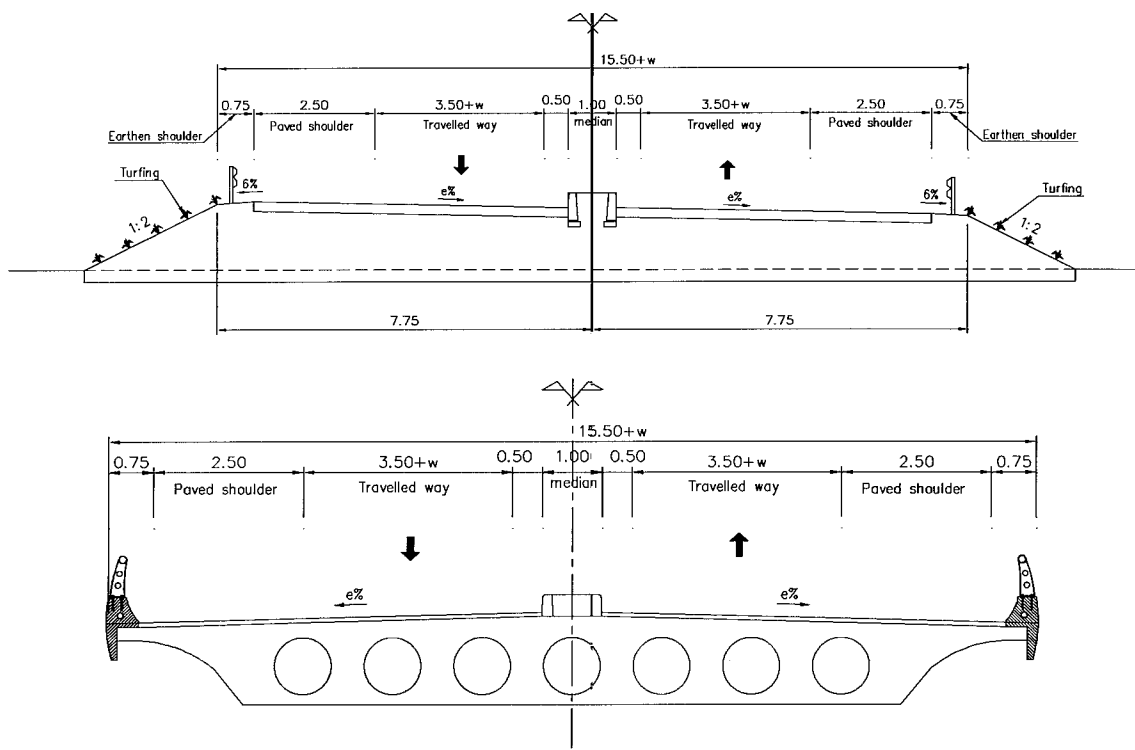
Typical Cross Sections of Interchange Ramp Way (2 Direction 1 Lane)
